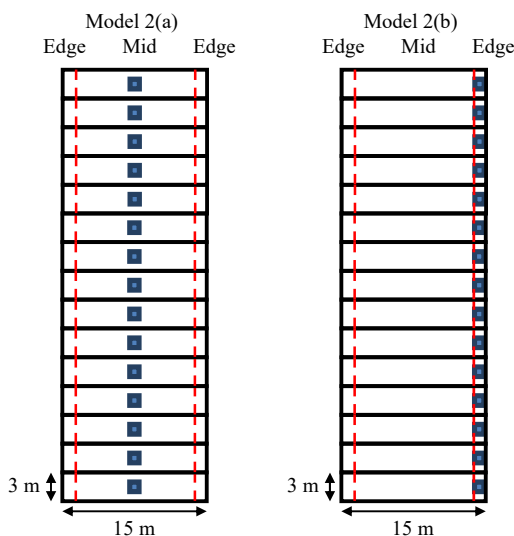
Dimension and windows layout for 15 stories structure (a) windows in the middle of structure, and (b) windows at the edge zone [9] of structure
